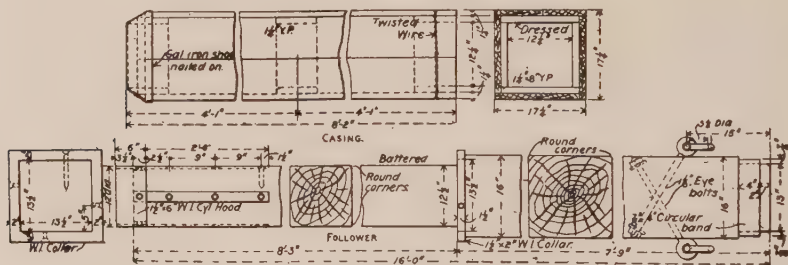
FORM AND BOX FOLLOWER FOR COMBINATION WOOD AND CONCRETE PILE.
